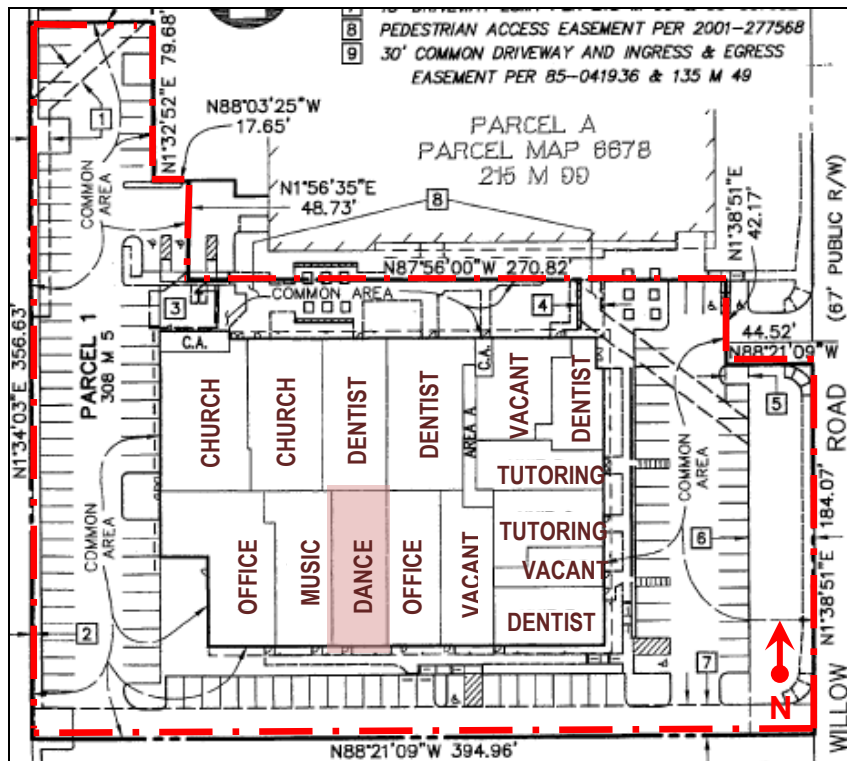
SITE PLAN OF SUBJECT PROPERTY
